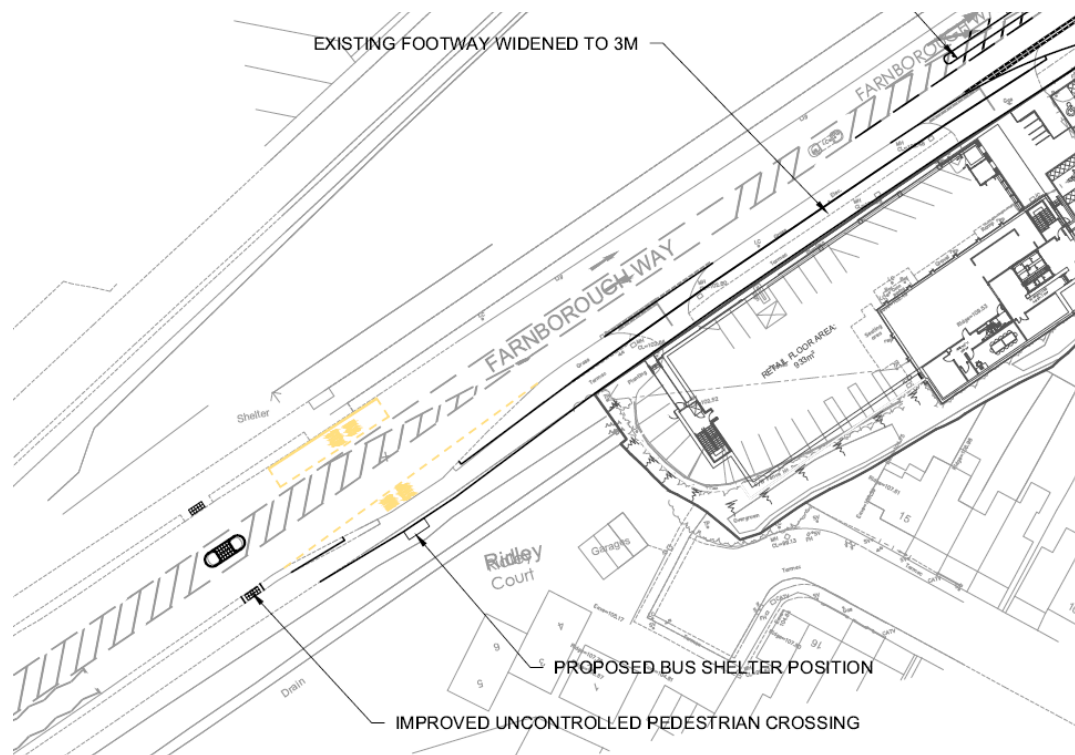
Footway/ cycleway widening to the part north of the application site
